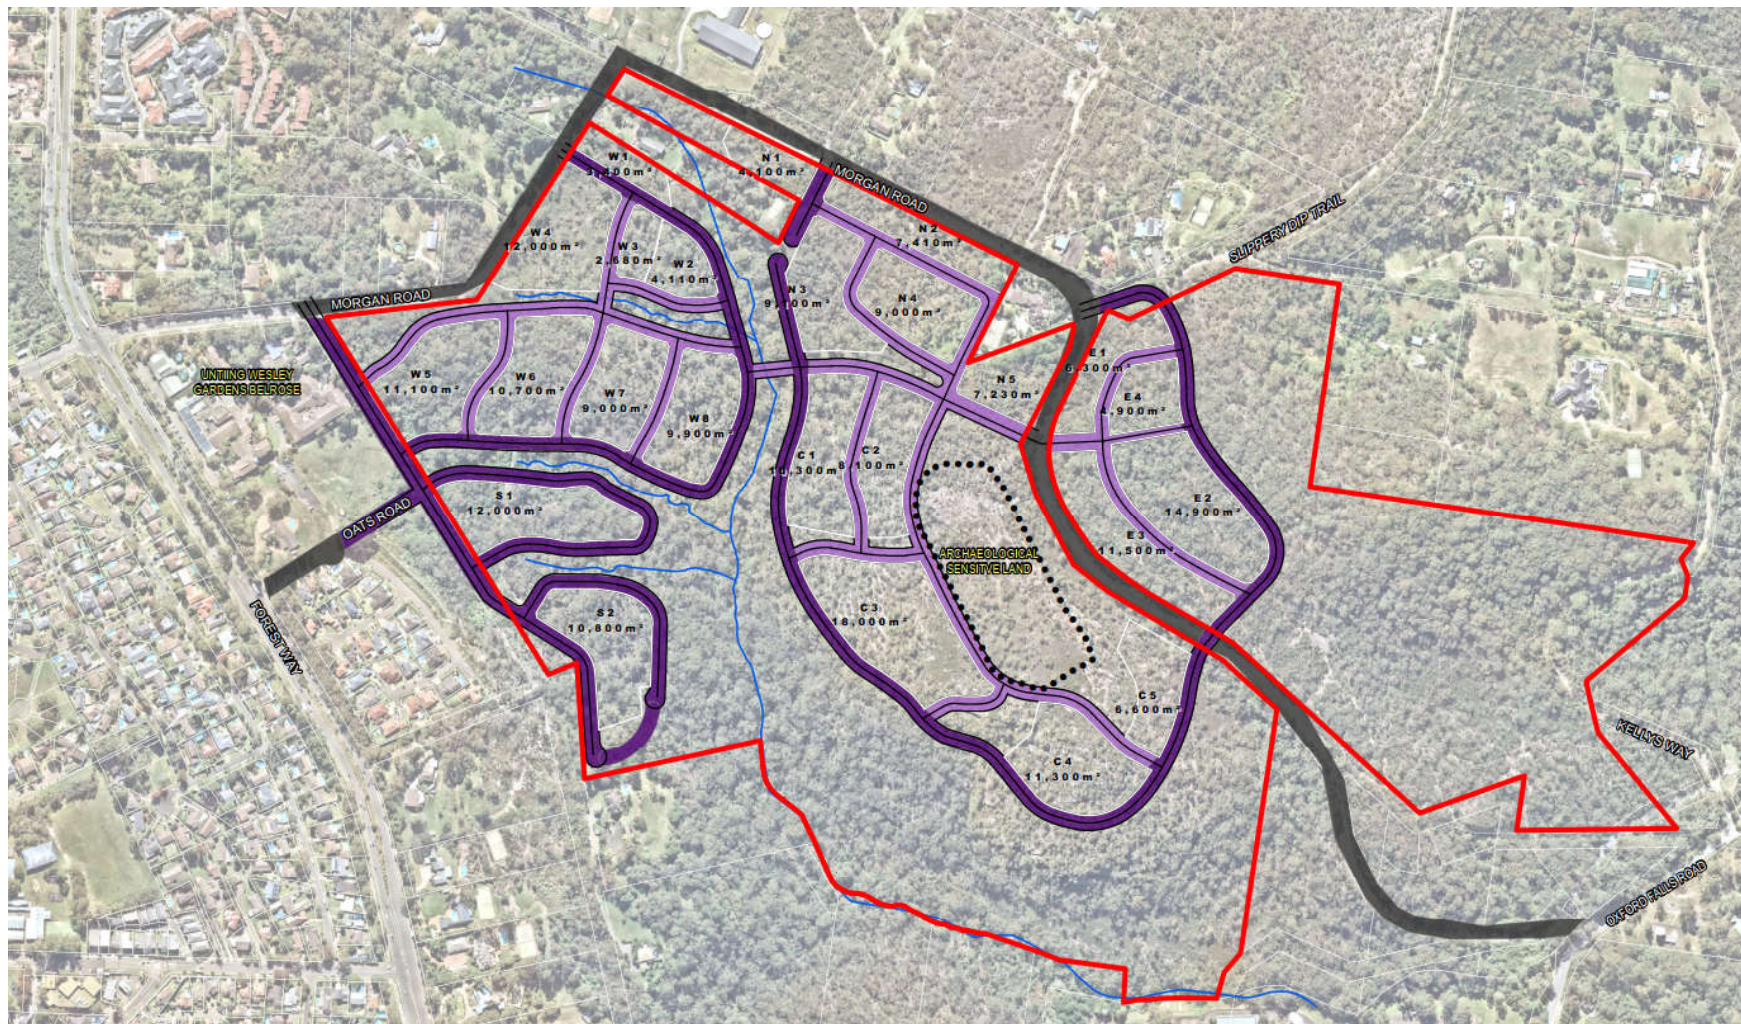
Proposed road layout identifying perimeter roads and non-perimeter roads
